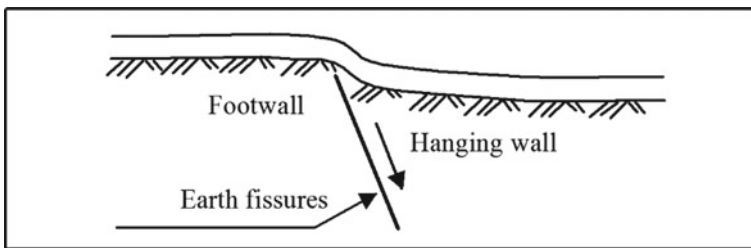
Illustration of slope-type road surface damage modes (Peng et al. 2017)
